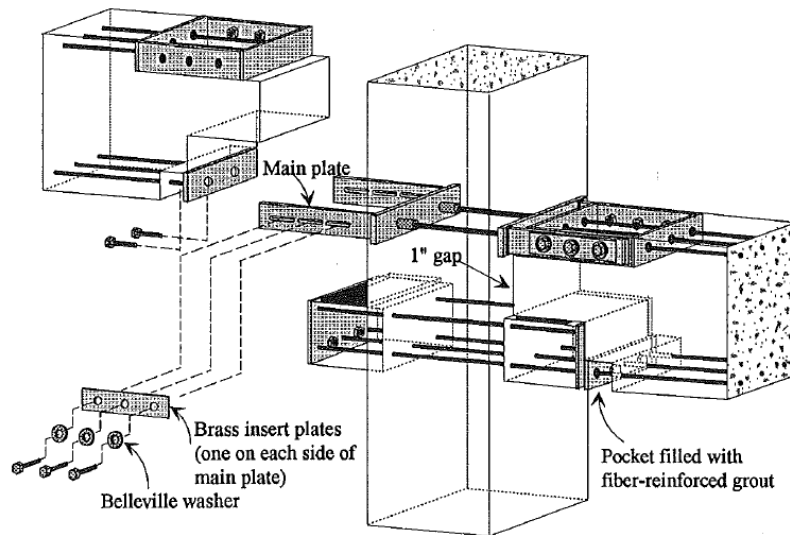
UT-FR connection detail (Palmieri et al., 1996).
